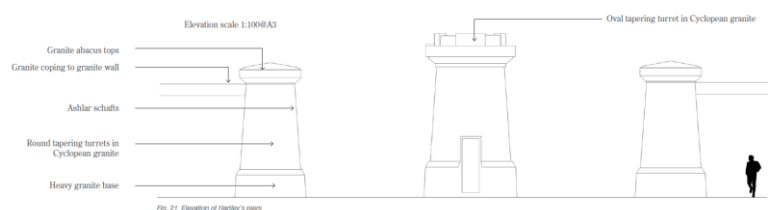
Elevation of Hartley's granite piers<sup>47</sup>
